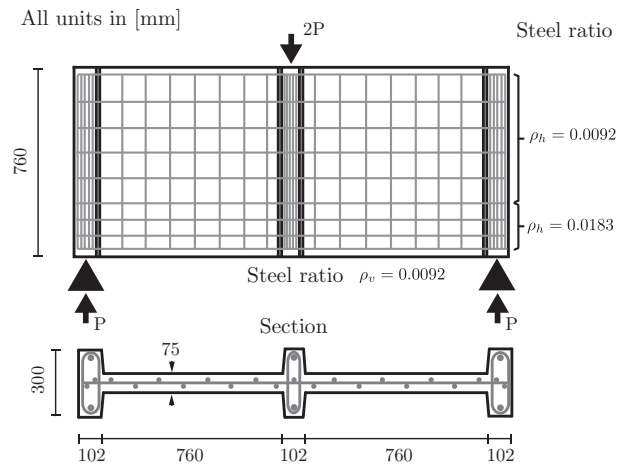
Geometry and reinforcement details of the RC specimen W2.
